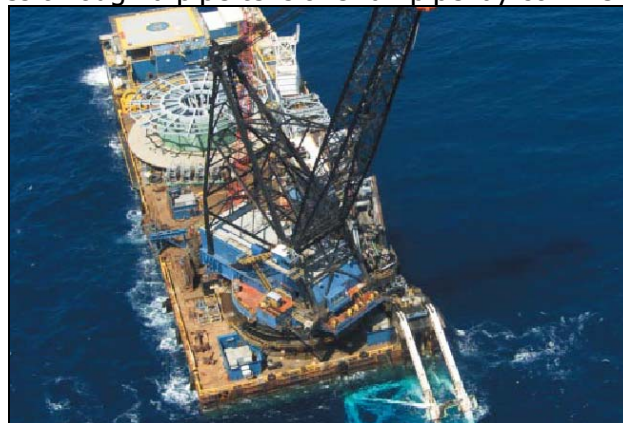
Vertical reel barge (Horizontal are available)
